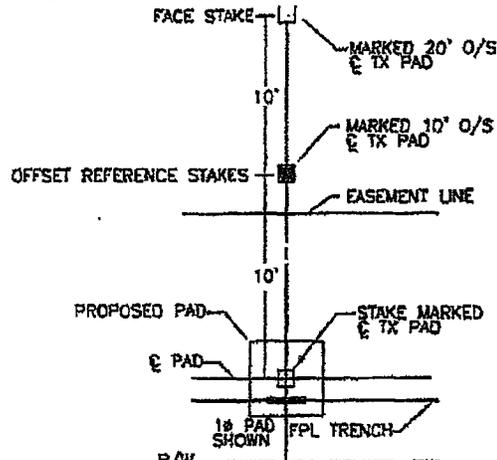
FRONT LOT URD CONSTRUCTION OFFSET STAKING
